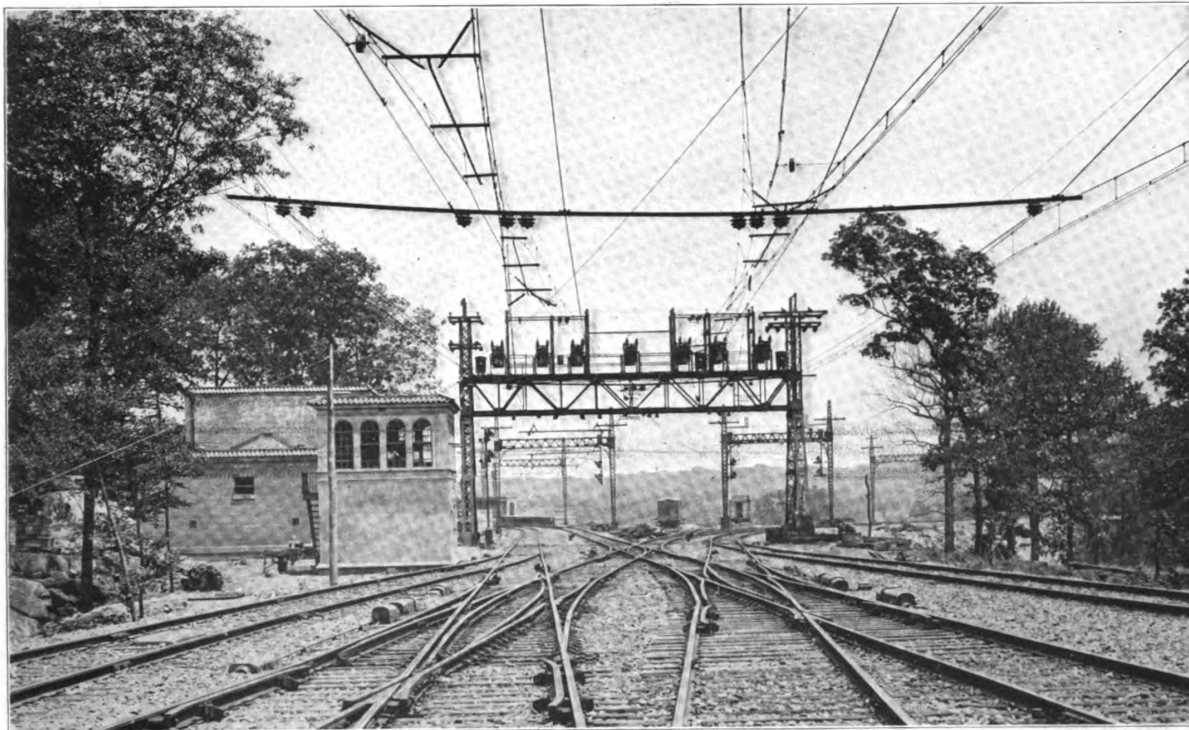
Columbus Avenue Junction, Showing the Anchor Bridge, Interlocking Station, and Signal Sub-Station.
